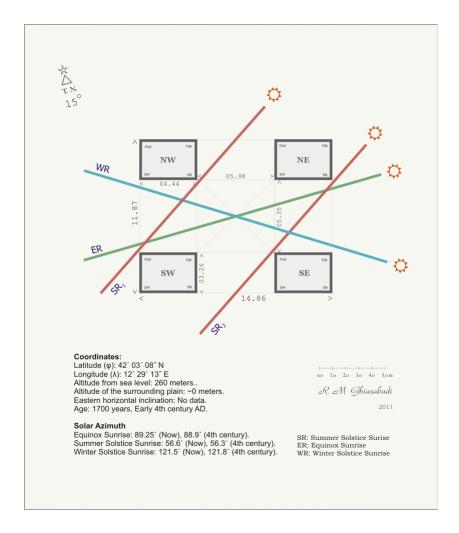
The floor plan and sightlines of Malborghetto Tetrapylon
